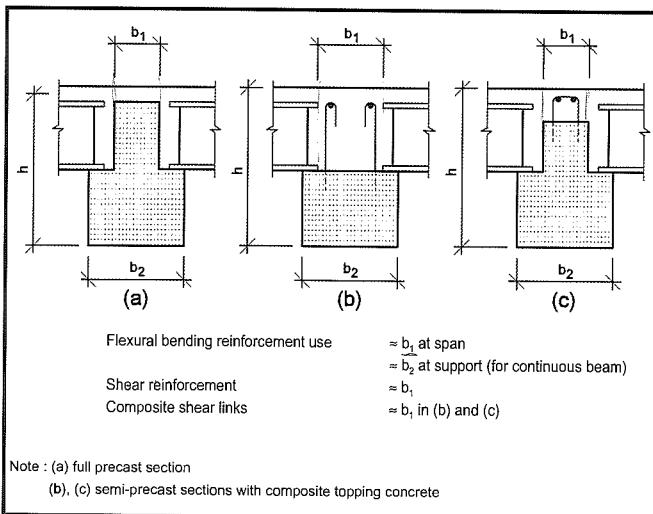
Effective Widths And Depths In Precast Beams Design
